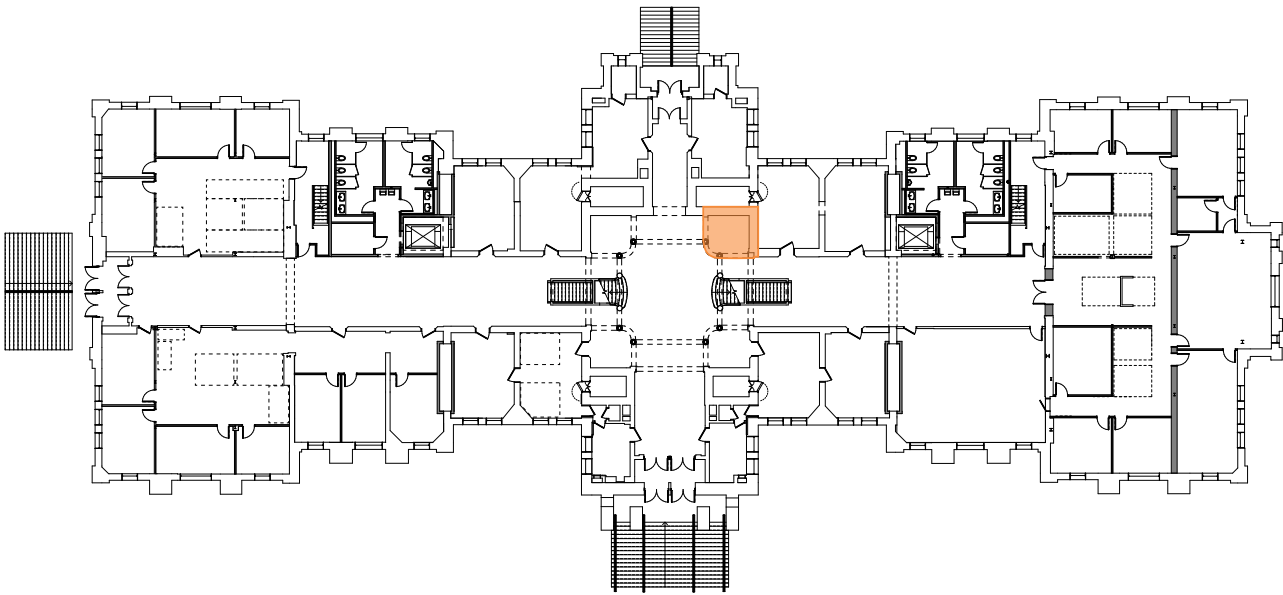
Proposed Space Allocation: Public Info & Tours - First Floor [Capitol]
